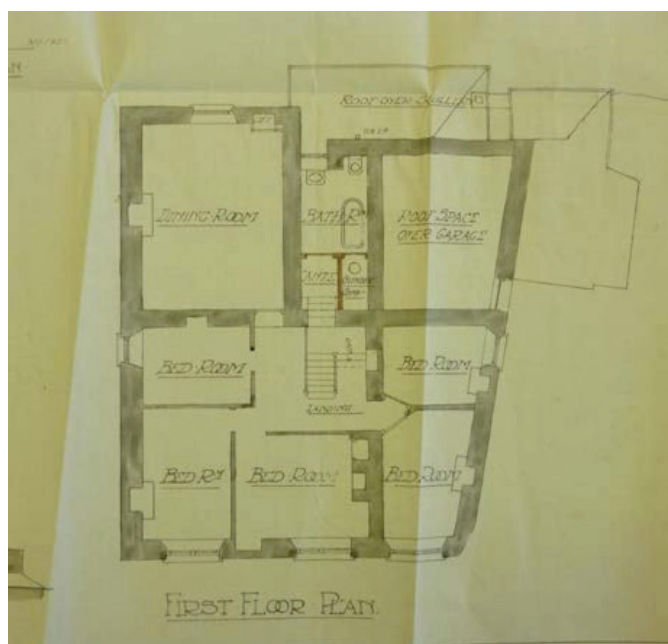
(right): Proposed first floor plan (CAC(B) BSRDNL/3/189 1921)
